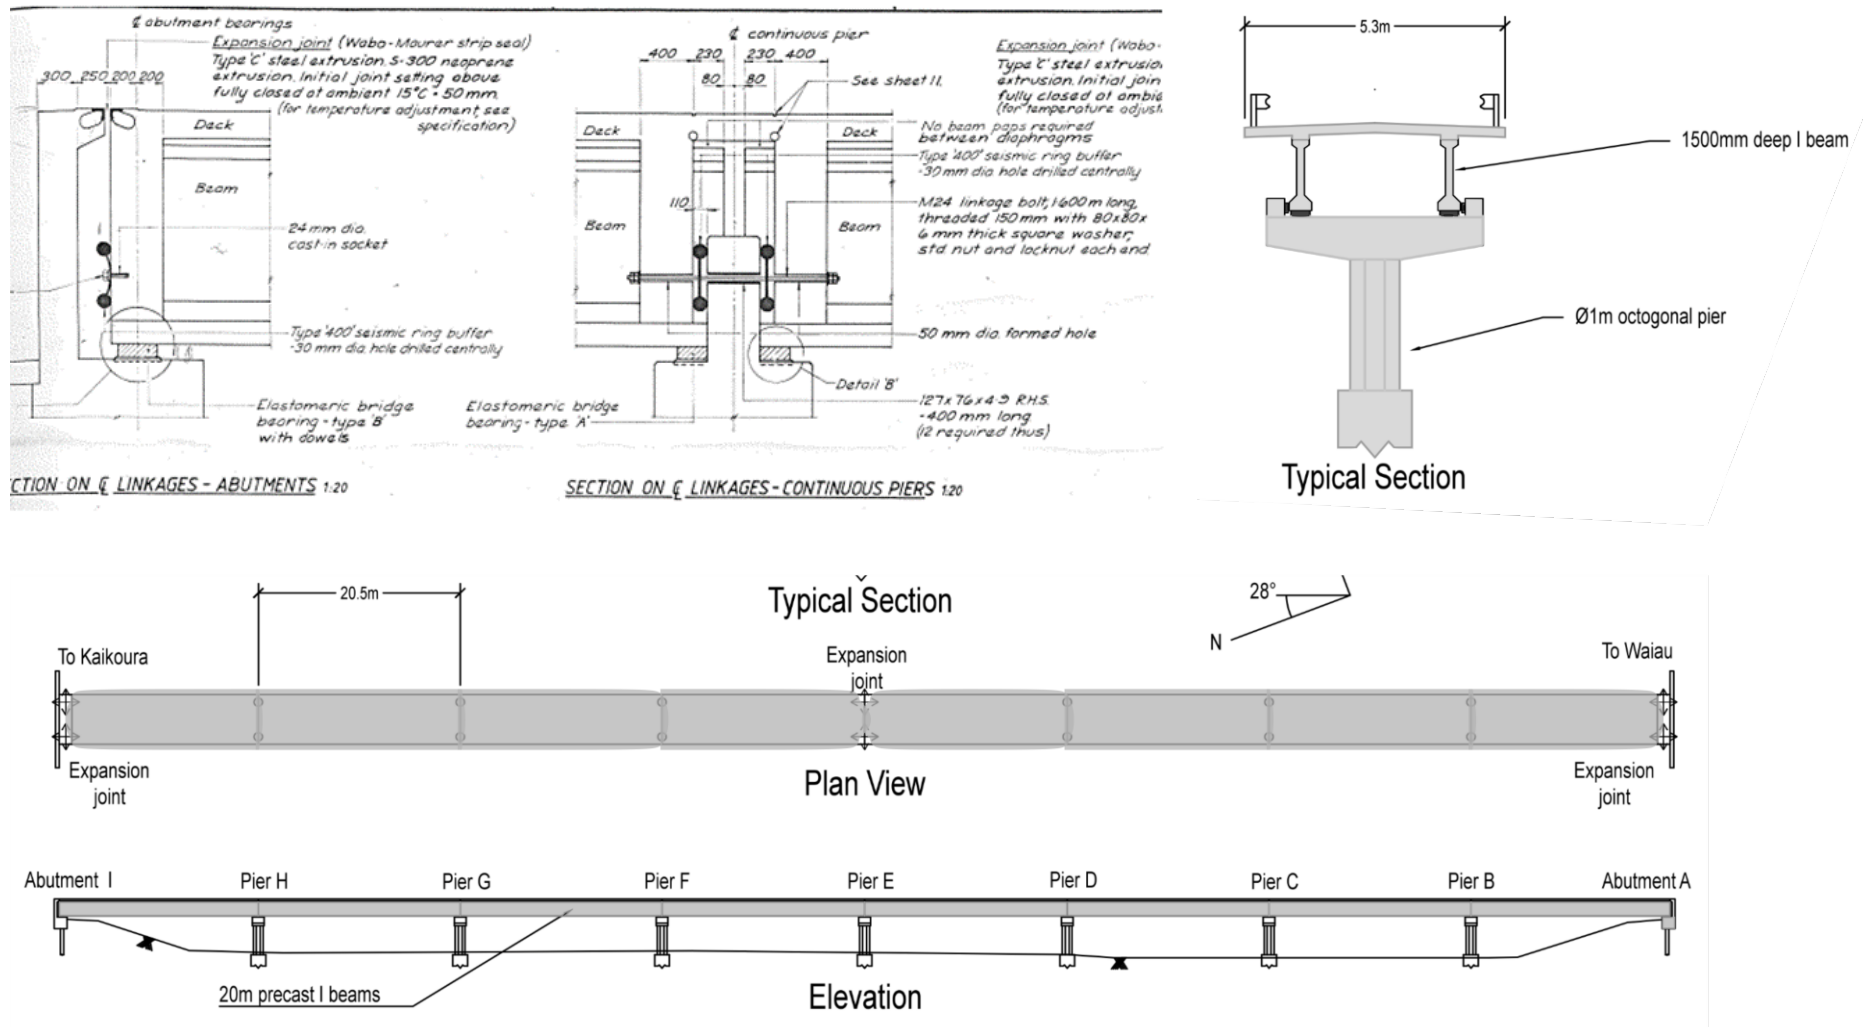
Key layout and detail information for the Lower Mason River Bridge.
